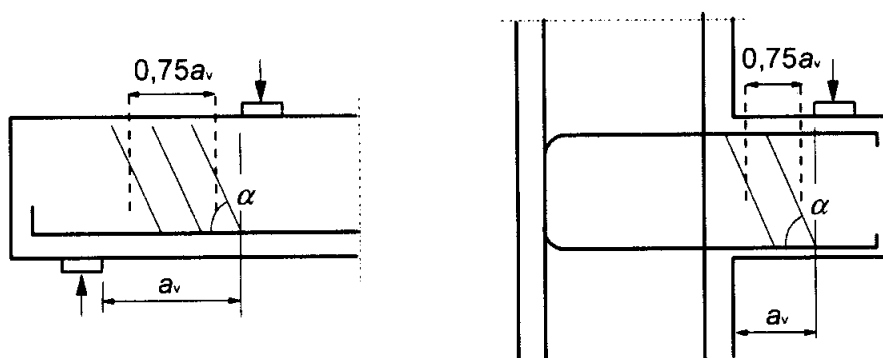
Shear reinforcement in short shear spans with direct strut action
